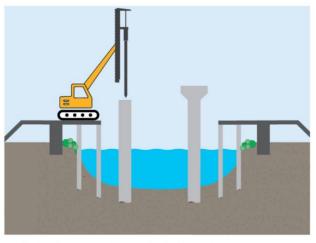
shows the typical process for constructing the bridges over the Parramatta River.
